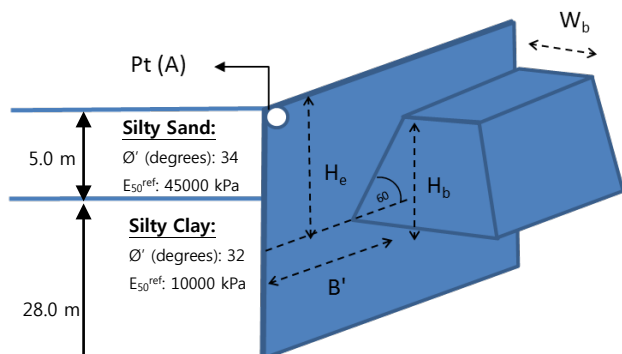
Typical soil model for the bermed excavation used in the parametric analysis
